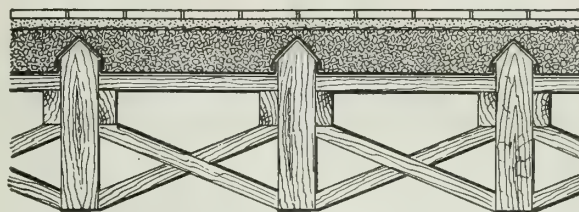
CONSTRUCTION FOR TILE IN OLD BUILDINGS
